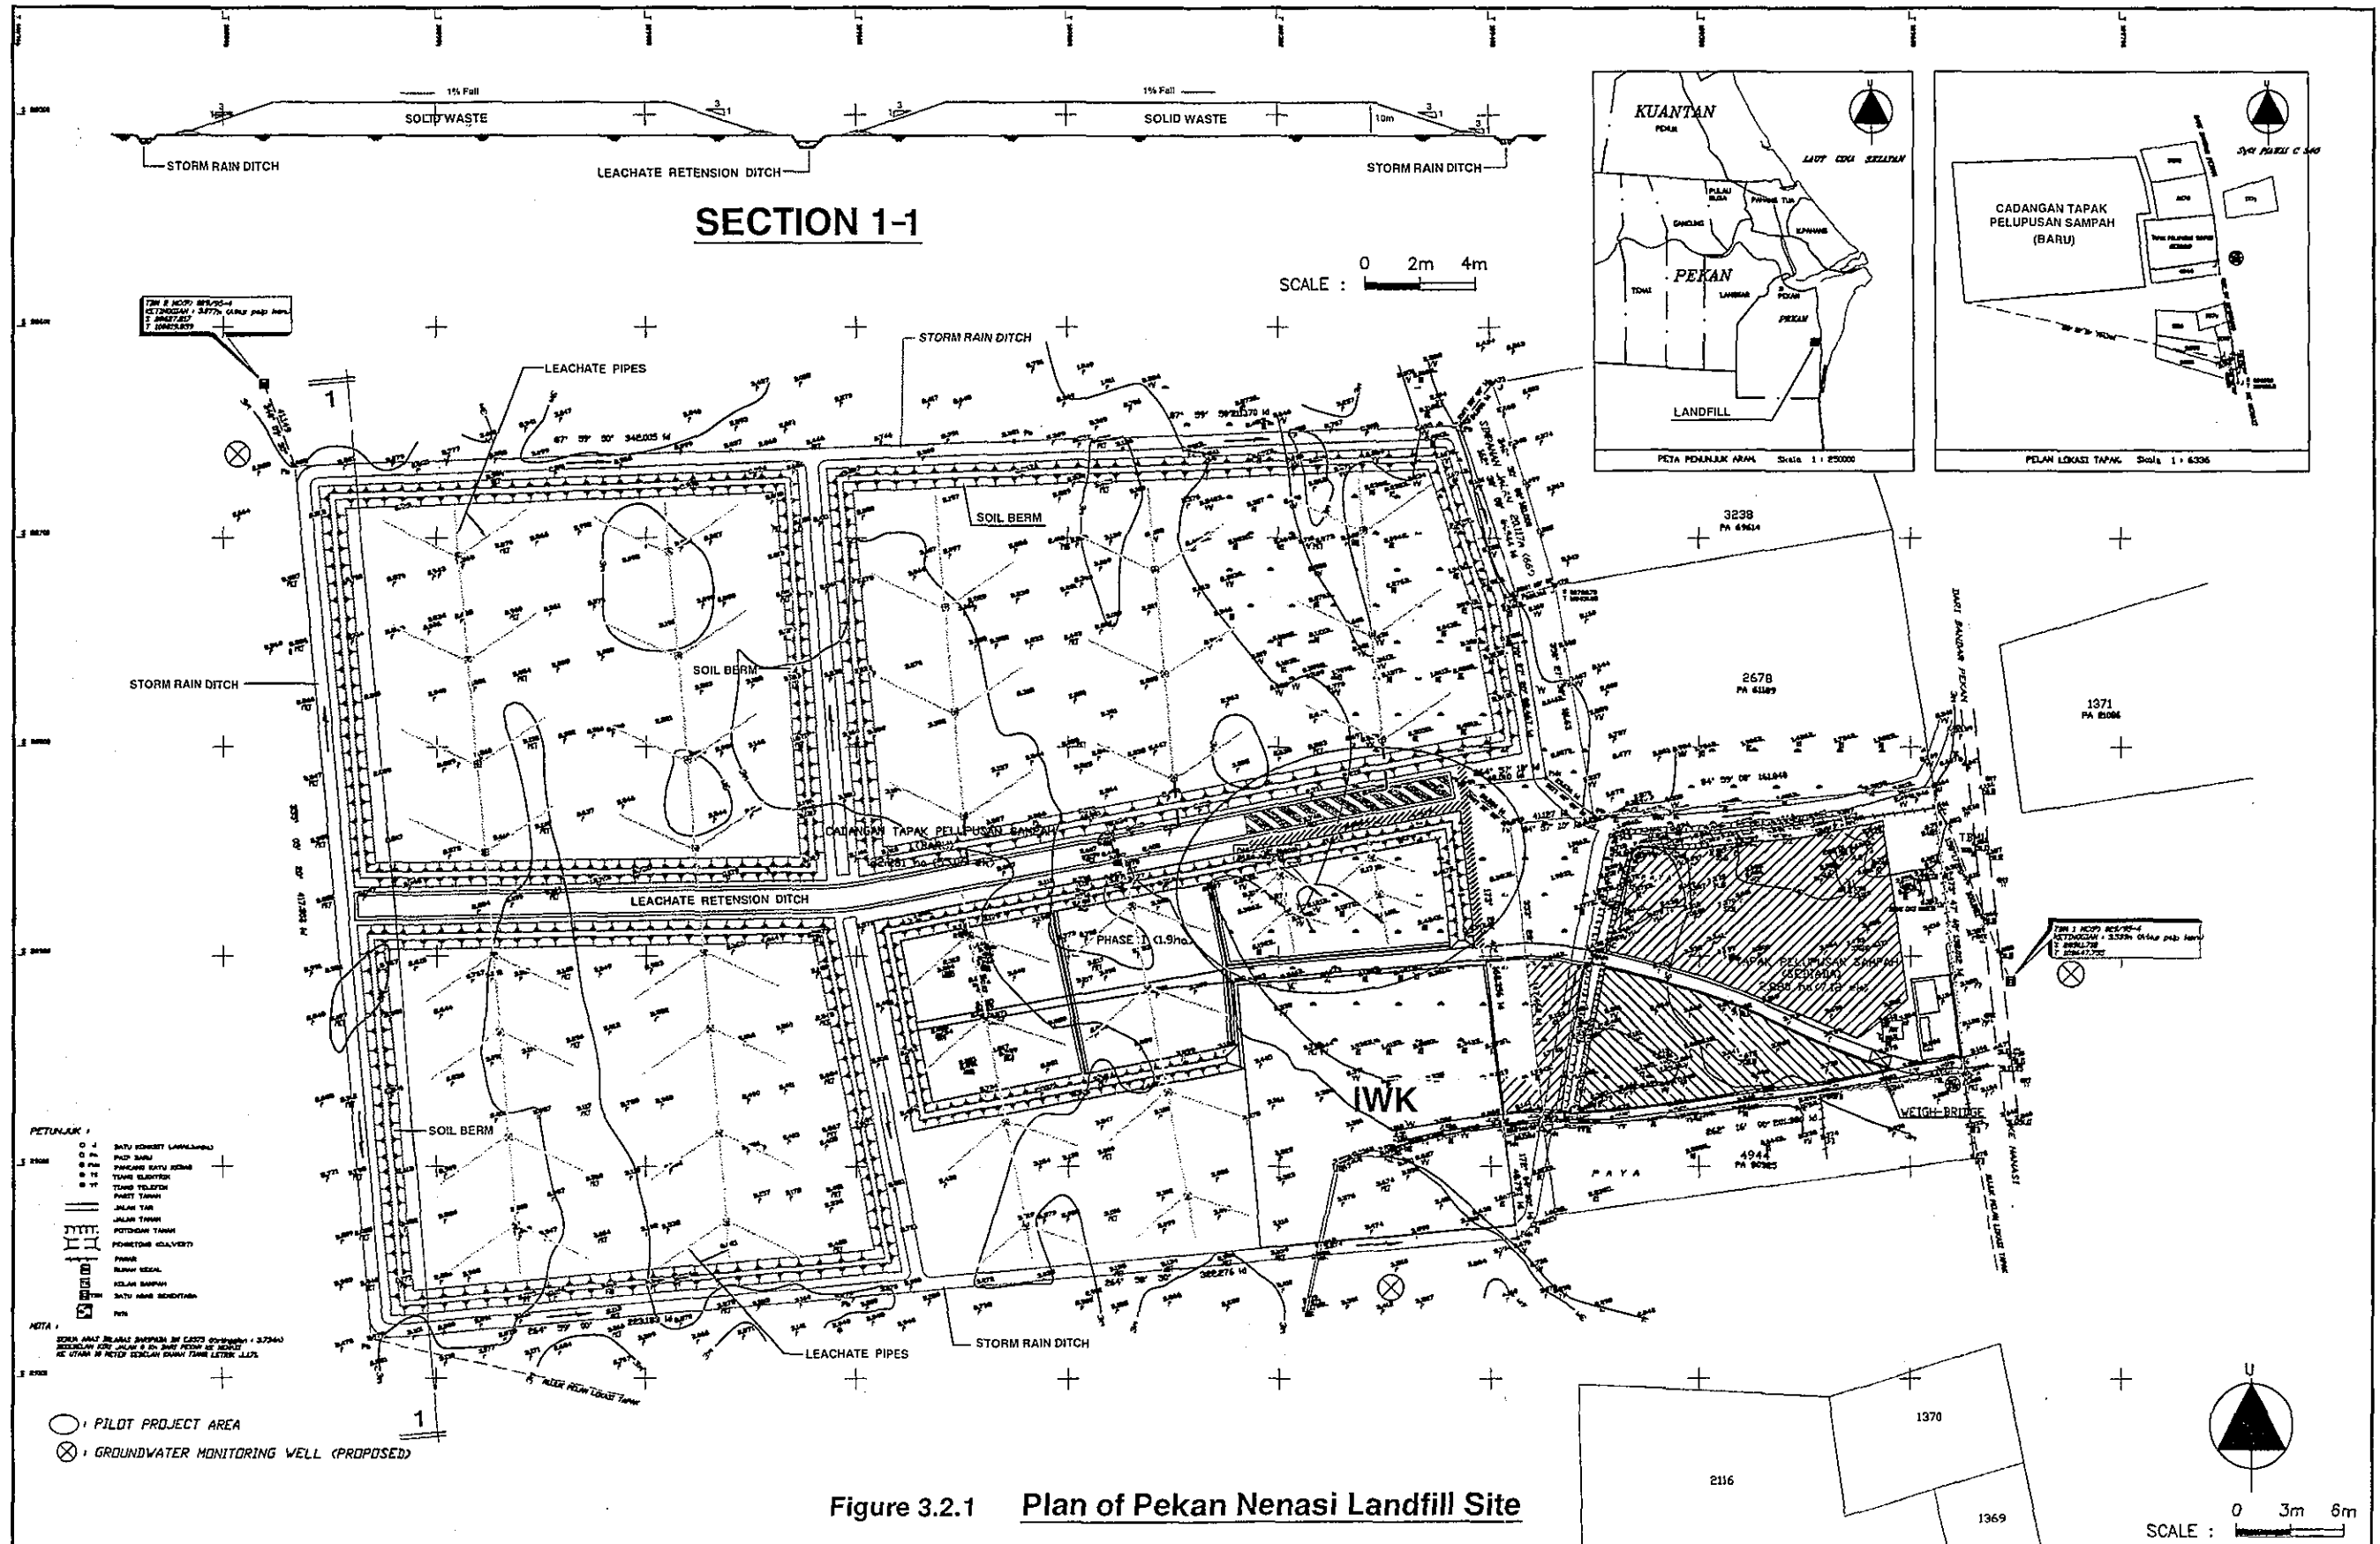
Plan of Pekan Nenas Landfill Site
